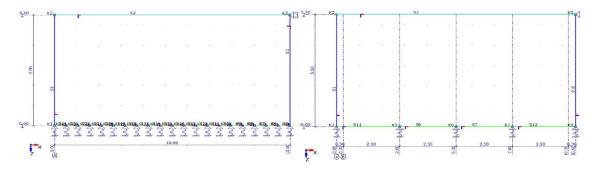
Static schematisation rail crossing section. Left: shallow foundation. Right: pile foundation and underwater concrete + piles or anchors.
